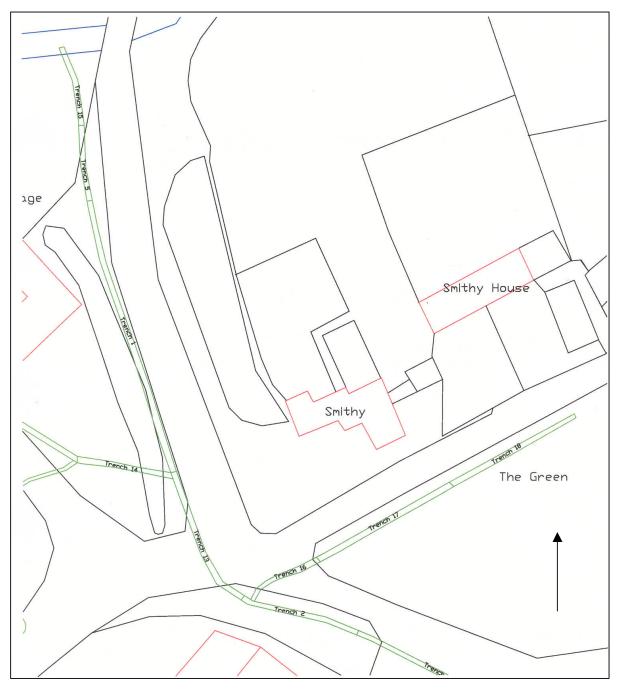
Trench Location Plan. North-Central part of the village, showing trenches 1,2,13-18. Scale. 1:500 @A4
